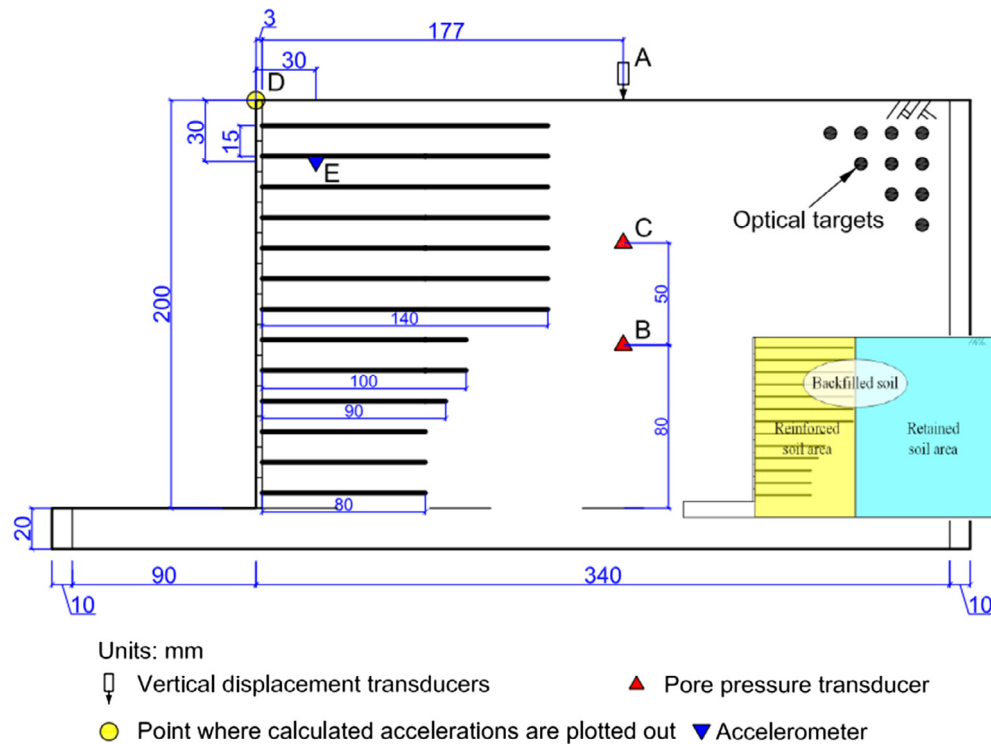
Layout and instrumentations of the reinforced-soil retaining wall.
